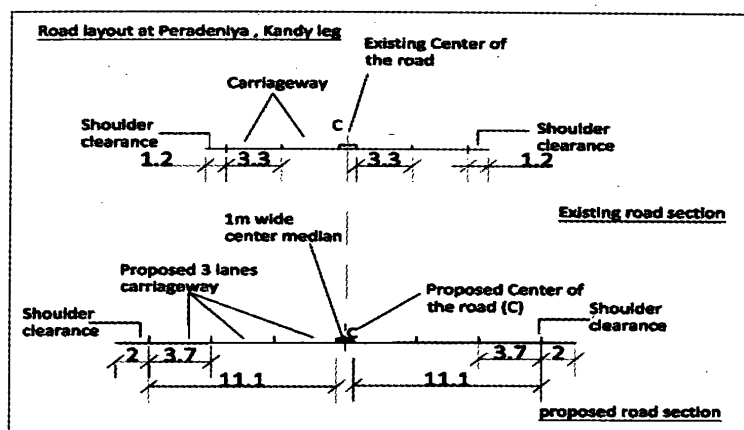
Geometric details of existing and proposed road sections for Kandy leg
